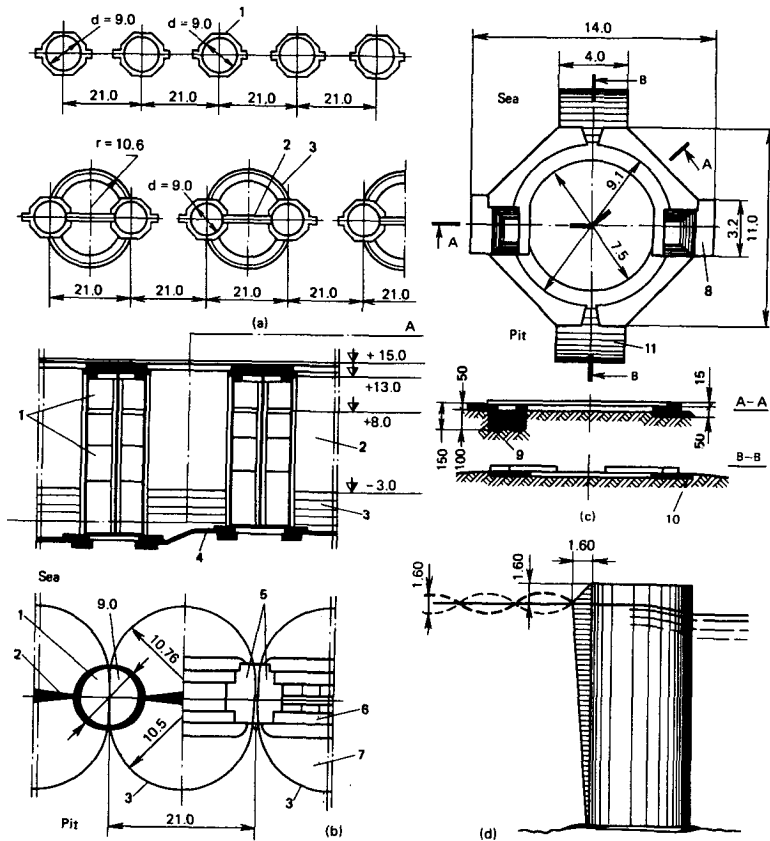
Cofferdam 21 m in diameter: (a) pattern of "comb" arrangement; (b) column-to-cell joint; (c) column foundation; (d) pressure profile; 1 - reinforced-concrete floating column; 2 - stoplogs; 3 - cells of metallic sheet piles; 4 - rock bed; 5 - overweight block; 6 - temporary bridge; 7 - sand; 8 - support projection for stoplogs; 9 - concrete slab under column shoe; 10 - foundation concrete ring under column; 11 - concrete-lines slope, 3:1 conjugation.
